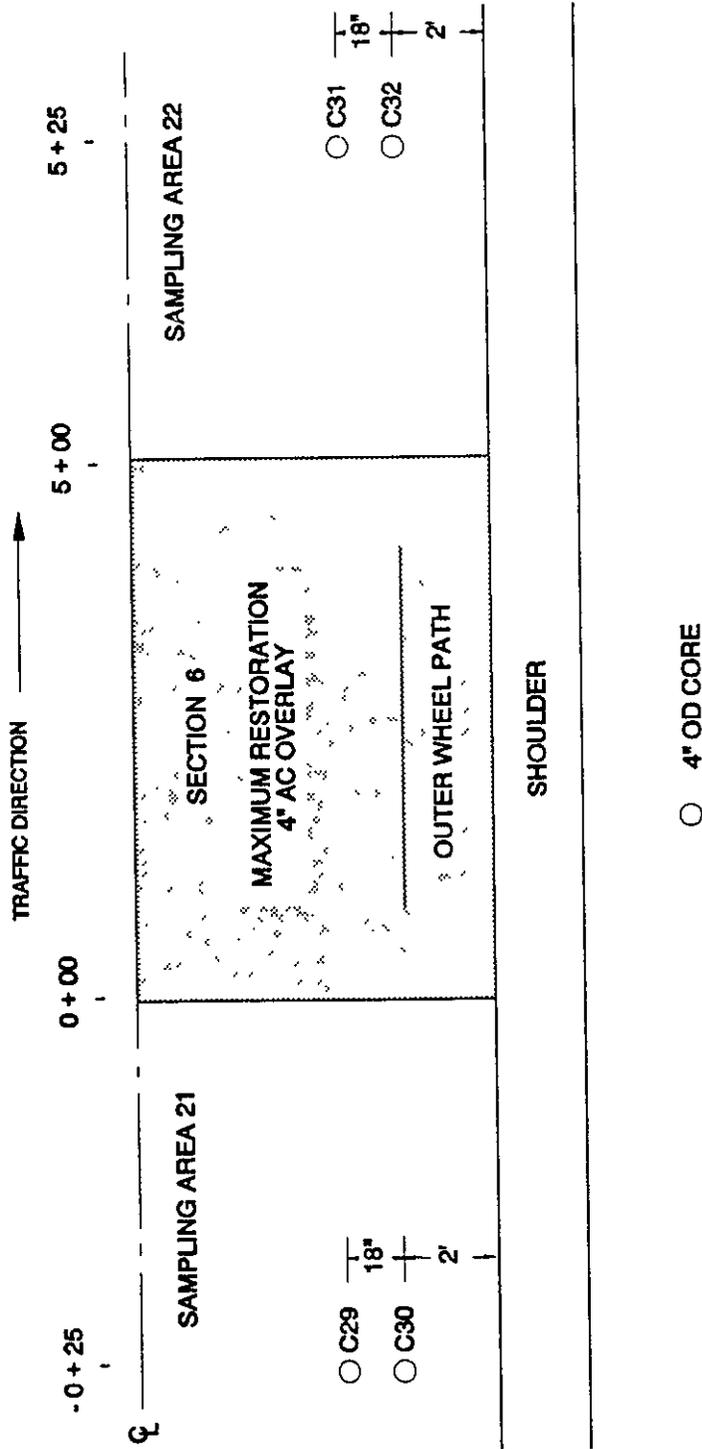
Example of "Post-Construction" Sampling Plan for Test Section 6
